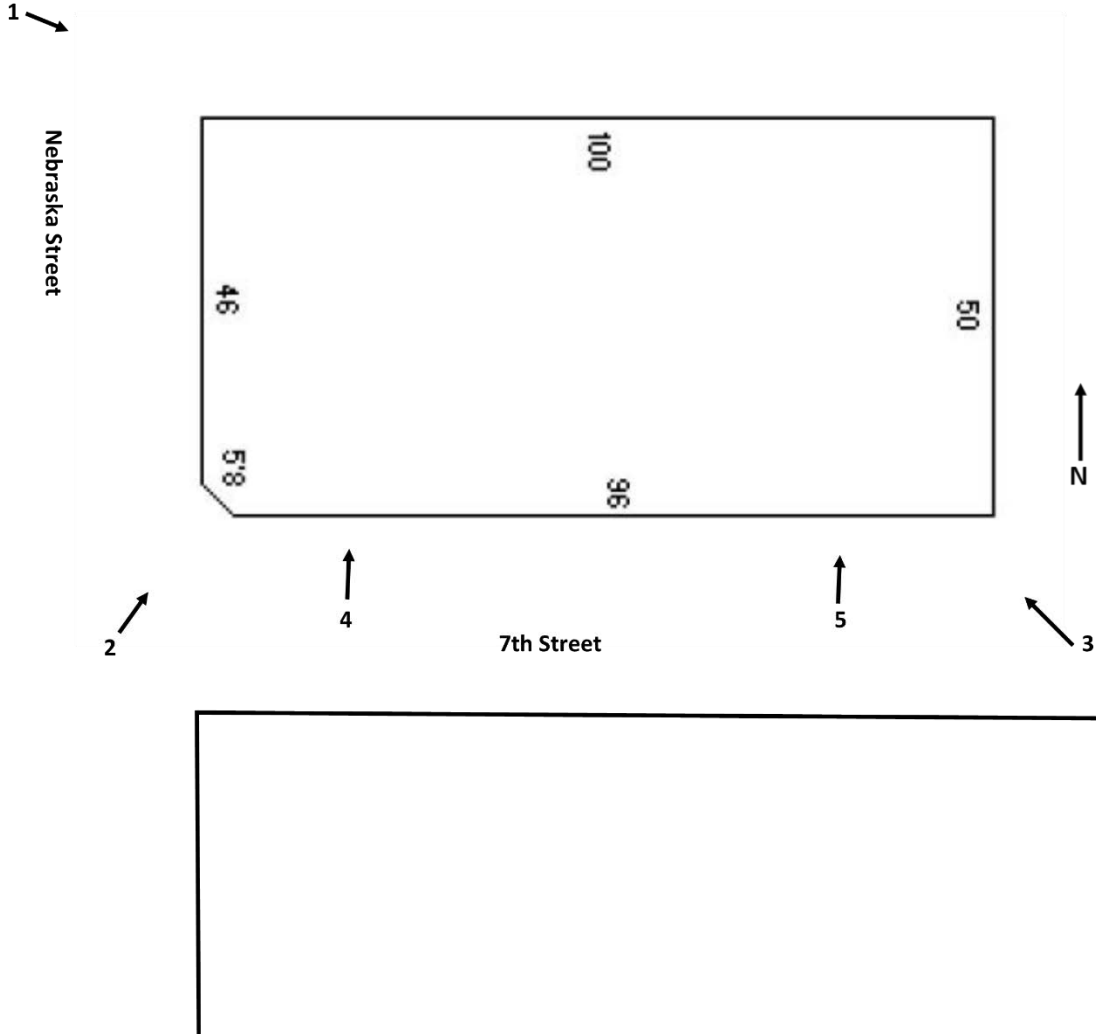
Showing the direction of the exterior photos, 1-5. Not to scale.
